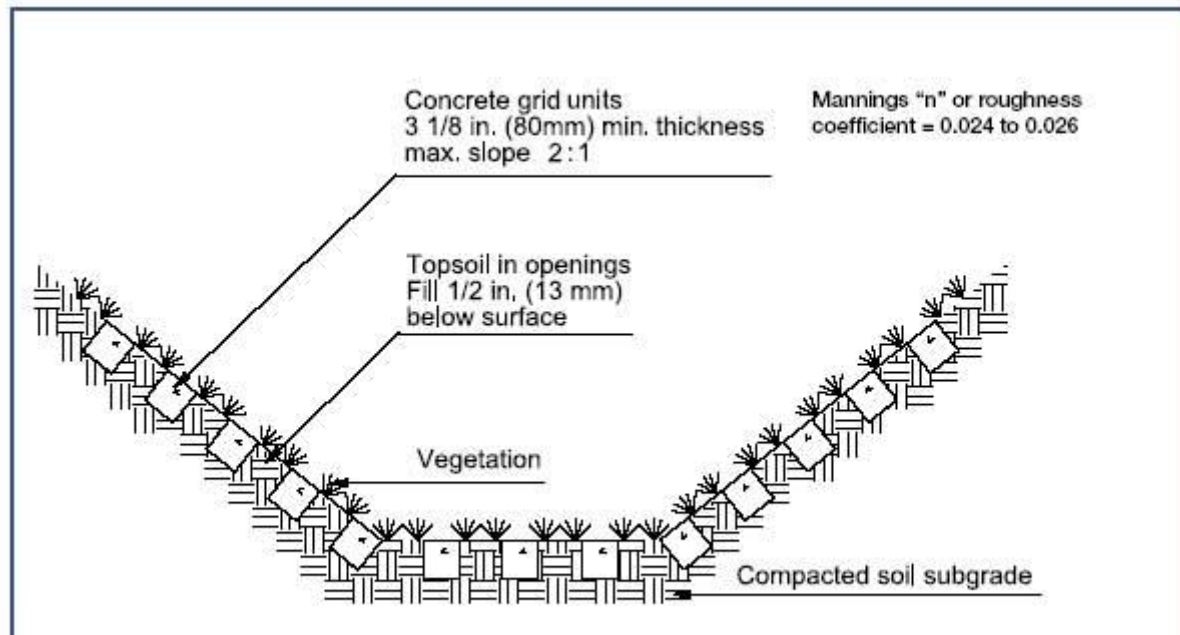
Ditch lined with concrete grid pavers for intermittent flow (17)
